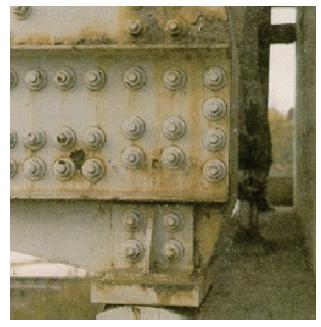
(e)	Truss Primary Connection at Abutment Bearing
